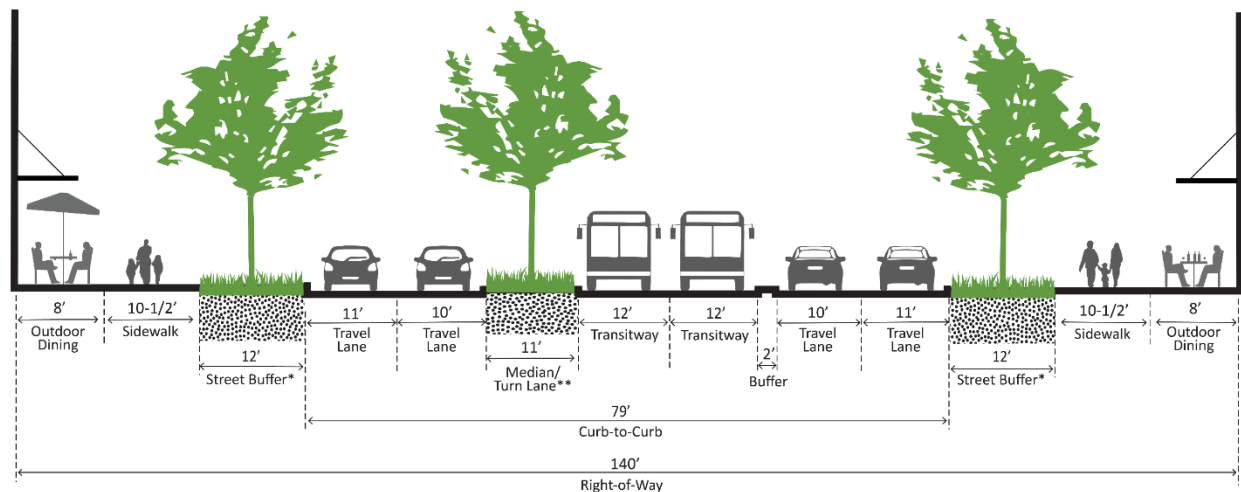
Georgia Avenue (M-8): Spring Street to Colesville Road, Looking North
